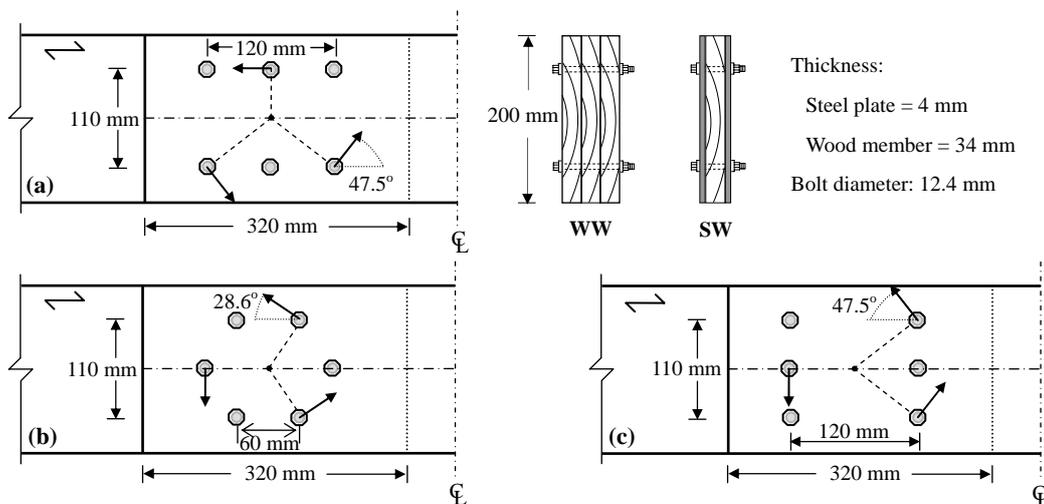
Fastener arrangements: (a) 6H bolt arrangement; (b) 6C bolt arrangement; and (c) 6V bolt arrangement
